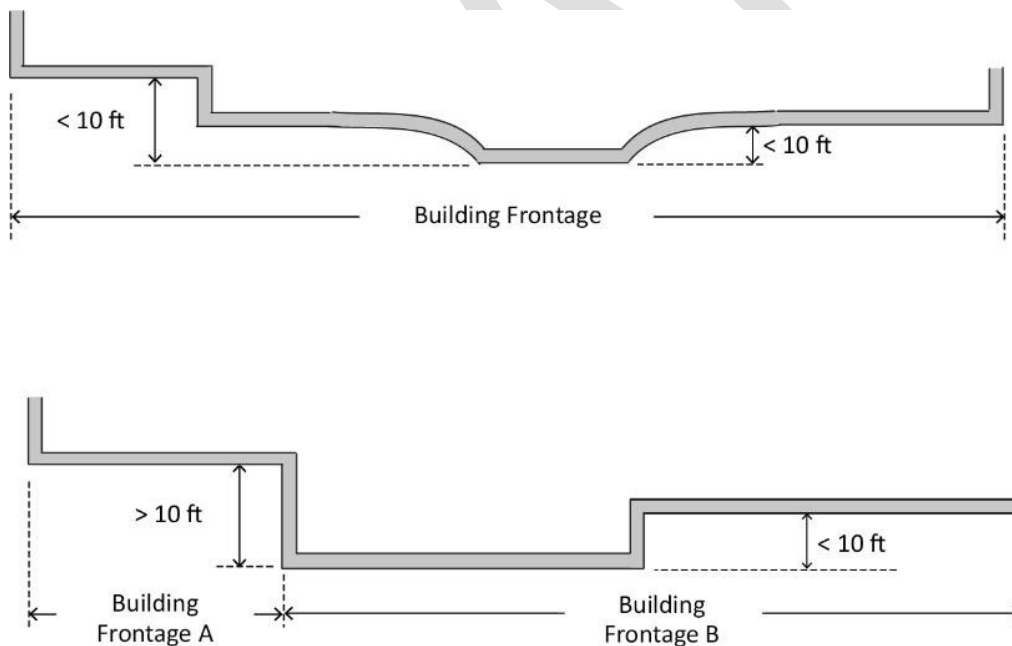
G: MEASURING BUILDING FRONTAGE
